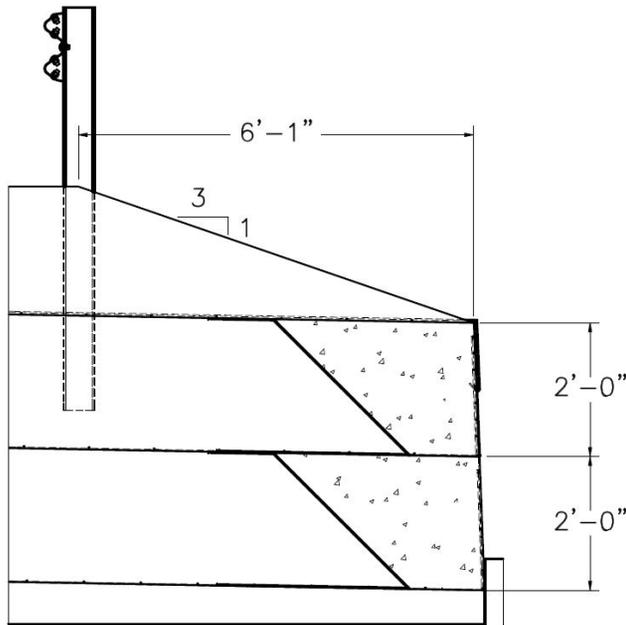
Non-Blocked MGS for MSE Wall Systems
